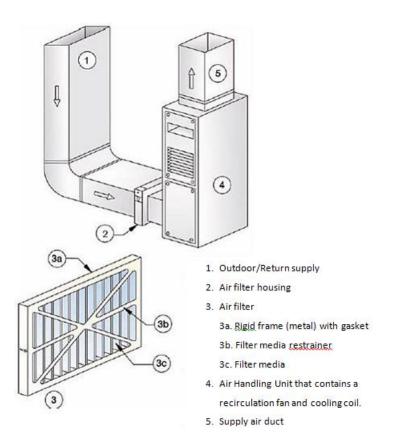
A typical air filter installation in an Air Handling Unit. Adapted and modified from EPA 402-F-09-002 Residential Air Cleaners, 2009.
